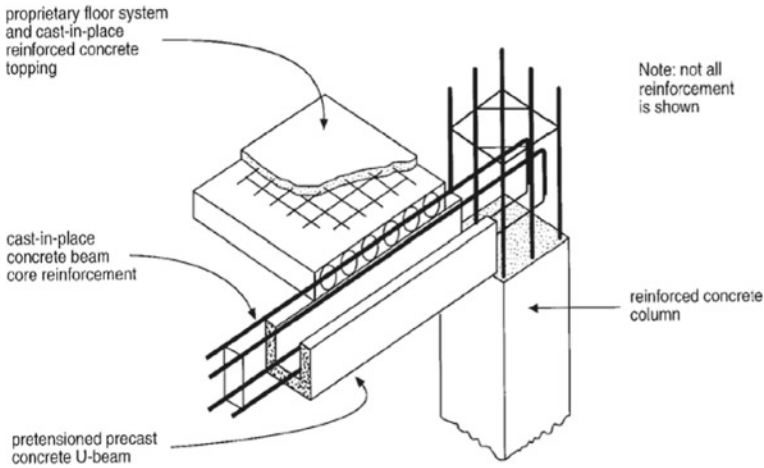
Typical connections of beam, column, and slab [4, 5]
